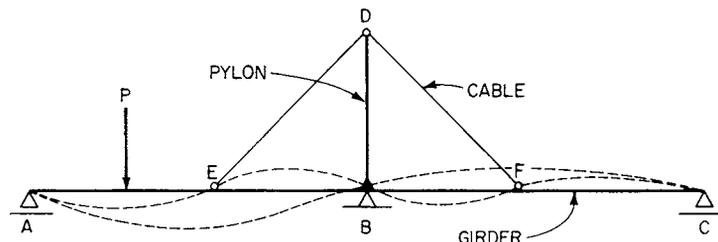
Dashed lines indicate deflected positions of a cable-stayed girder.
